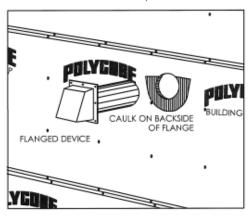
TYPICAL PENETRATION FLASHING DETAIL - FLANGED
